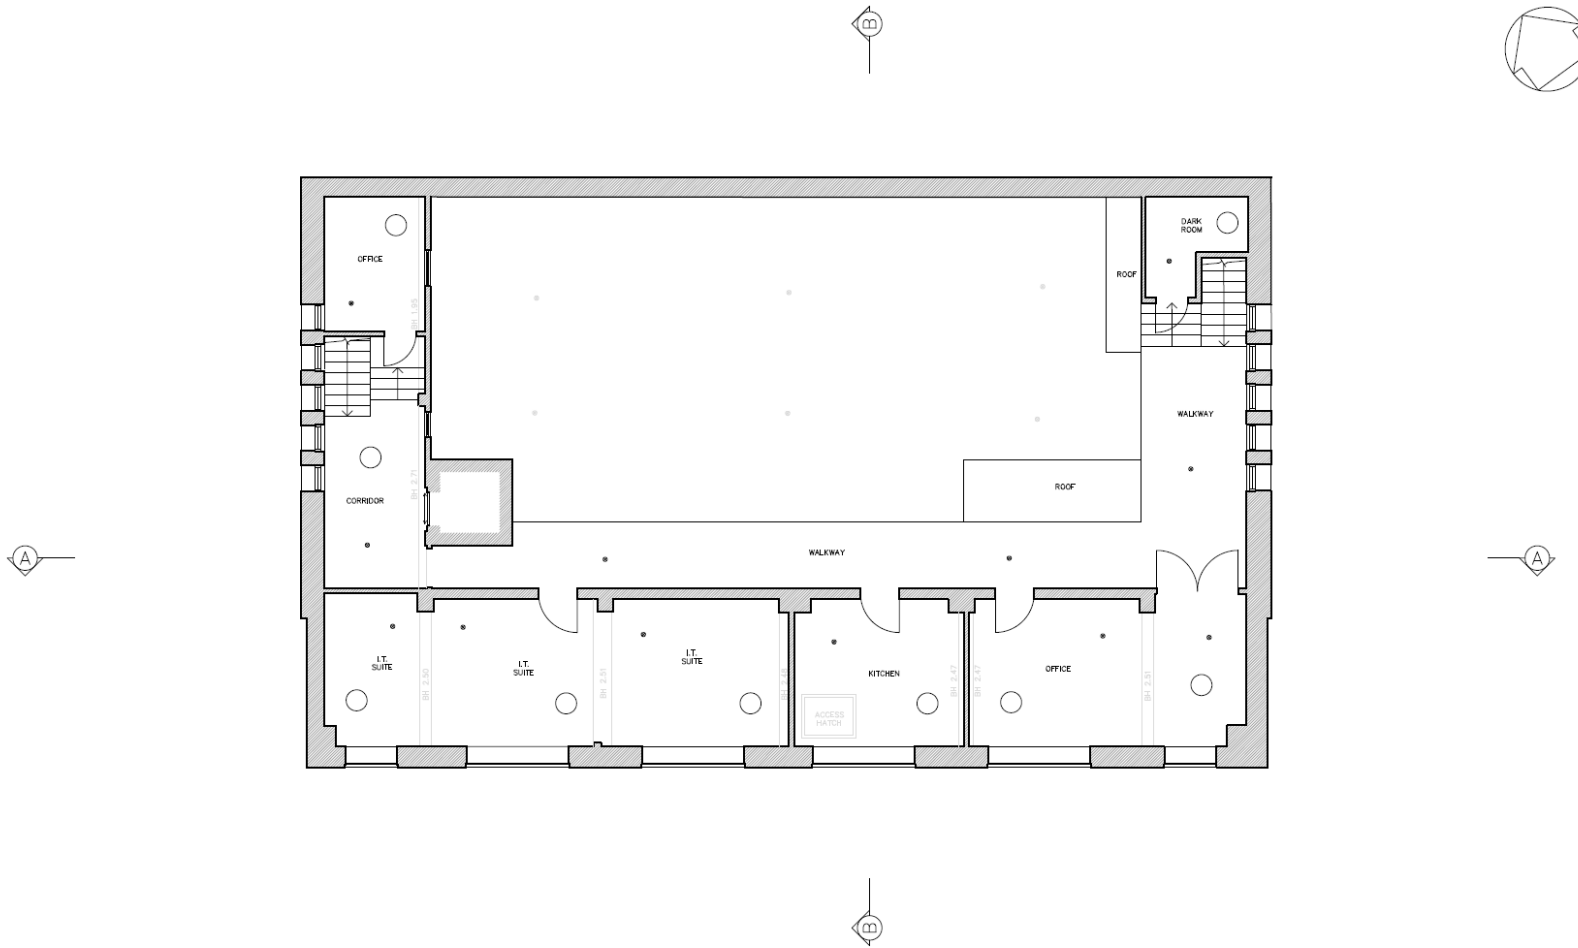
Architectural Plan Pre-retrofit Mayville Community Centre First Floor
